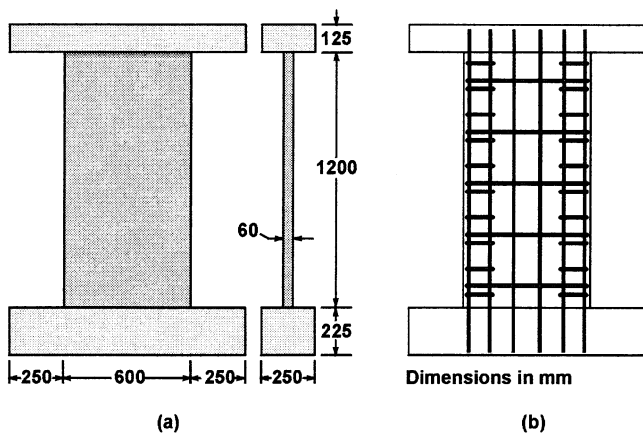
Details of SW walls: (a) dimensions; and (b) typical reinforcement layout.
